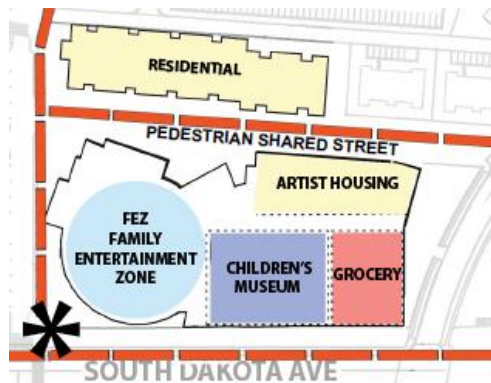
Detail of Proposed Phase B Site Plan (labelled Building B in Fig. 1)
